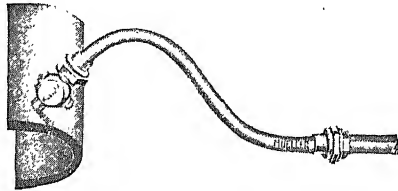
Lead “goose-neck” with brass fittings. (*Courtesy Mueller Co.*)
